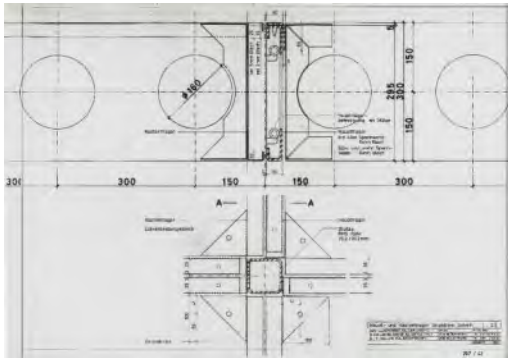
Typical joint between pillar and beam – gta Archives/ETH Zurich, Fritz Haller.
